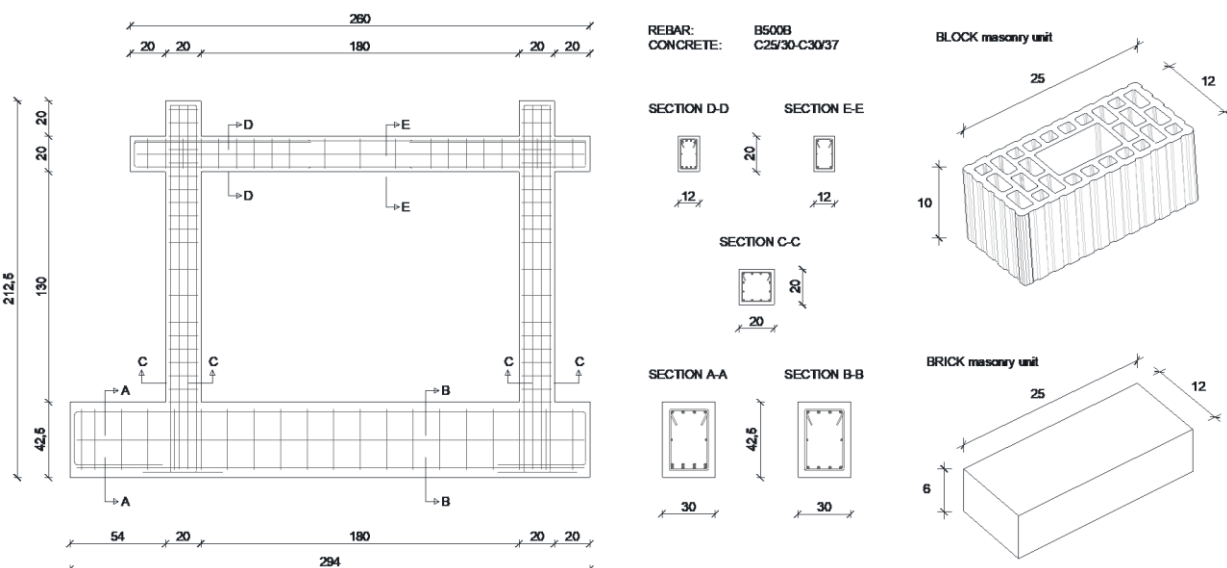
Reinforcement details of test RC frames (measures in cm) and clay block masonry unit used
